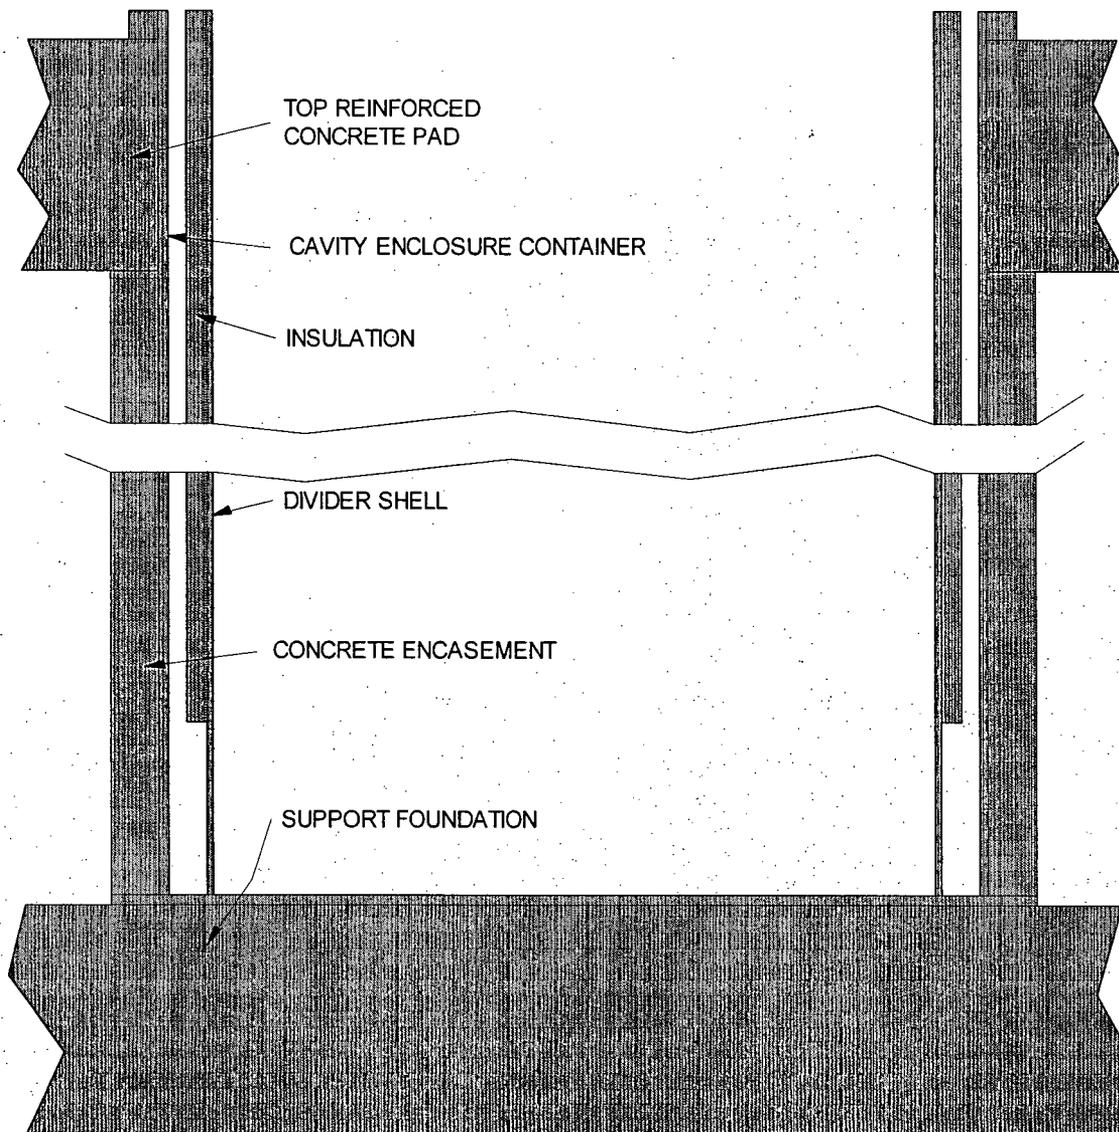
I.3: TYPICAL CONCRETE ENCASEMENT OF THE CEC
